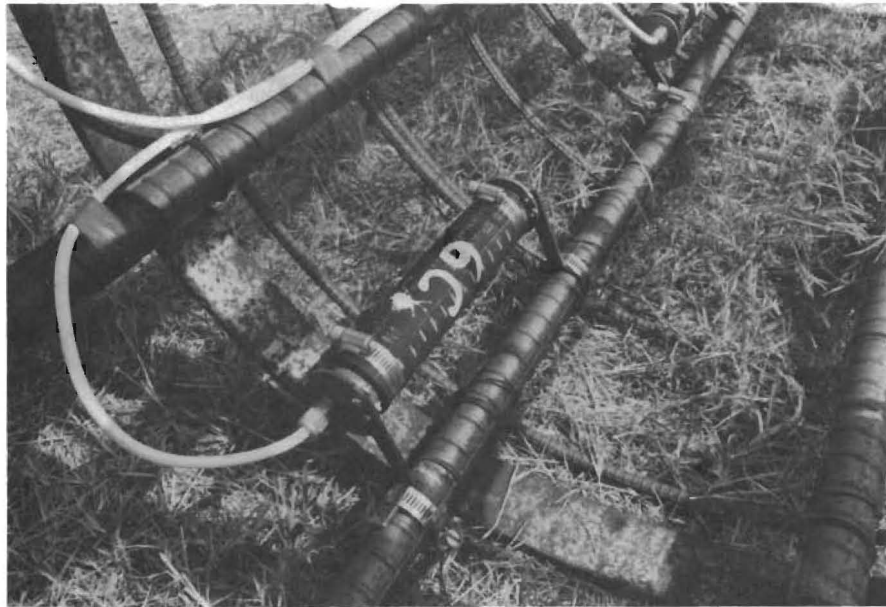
Arrangement of attaching a Mustran cell to the main reinforcement.
